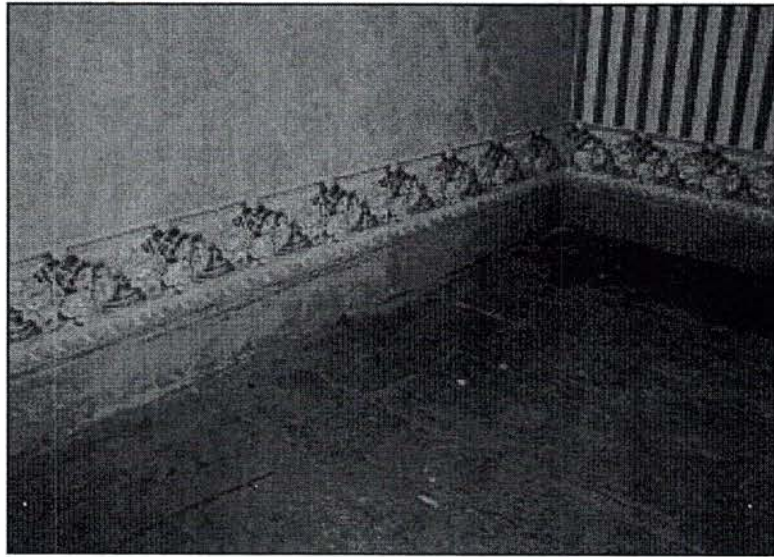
Detail of the floor and baseboard in Room 208. The moldings for the second floor of the rear ell are less elaborate than those found in the main section of the house.
